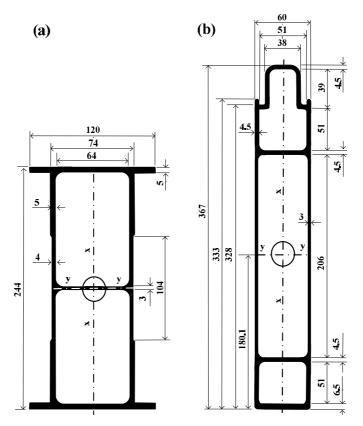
Startlink shapes: a) floor beam; b) stud-column .
